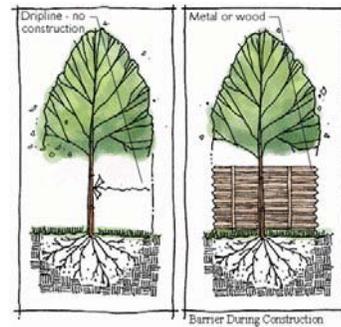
Construct a Barrier at Drip Line During Construction to Maintain Grade
